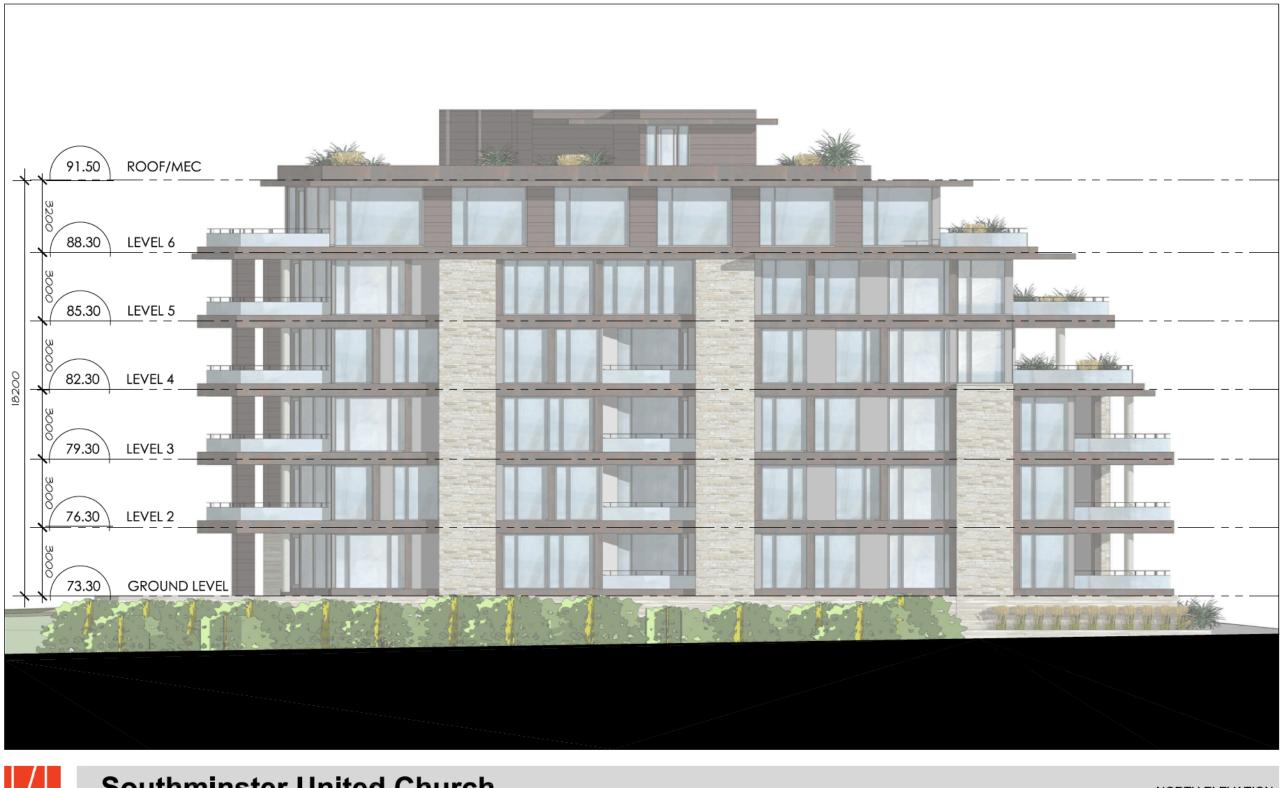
Proposed north condo elevation prepared by Hobin Architecture
